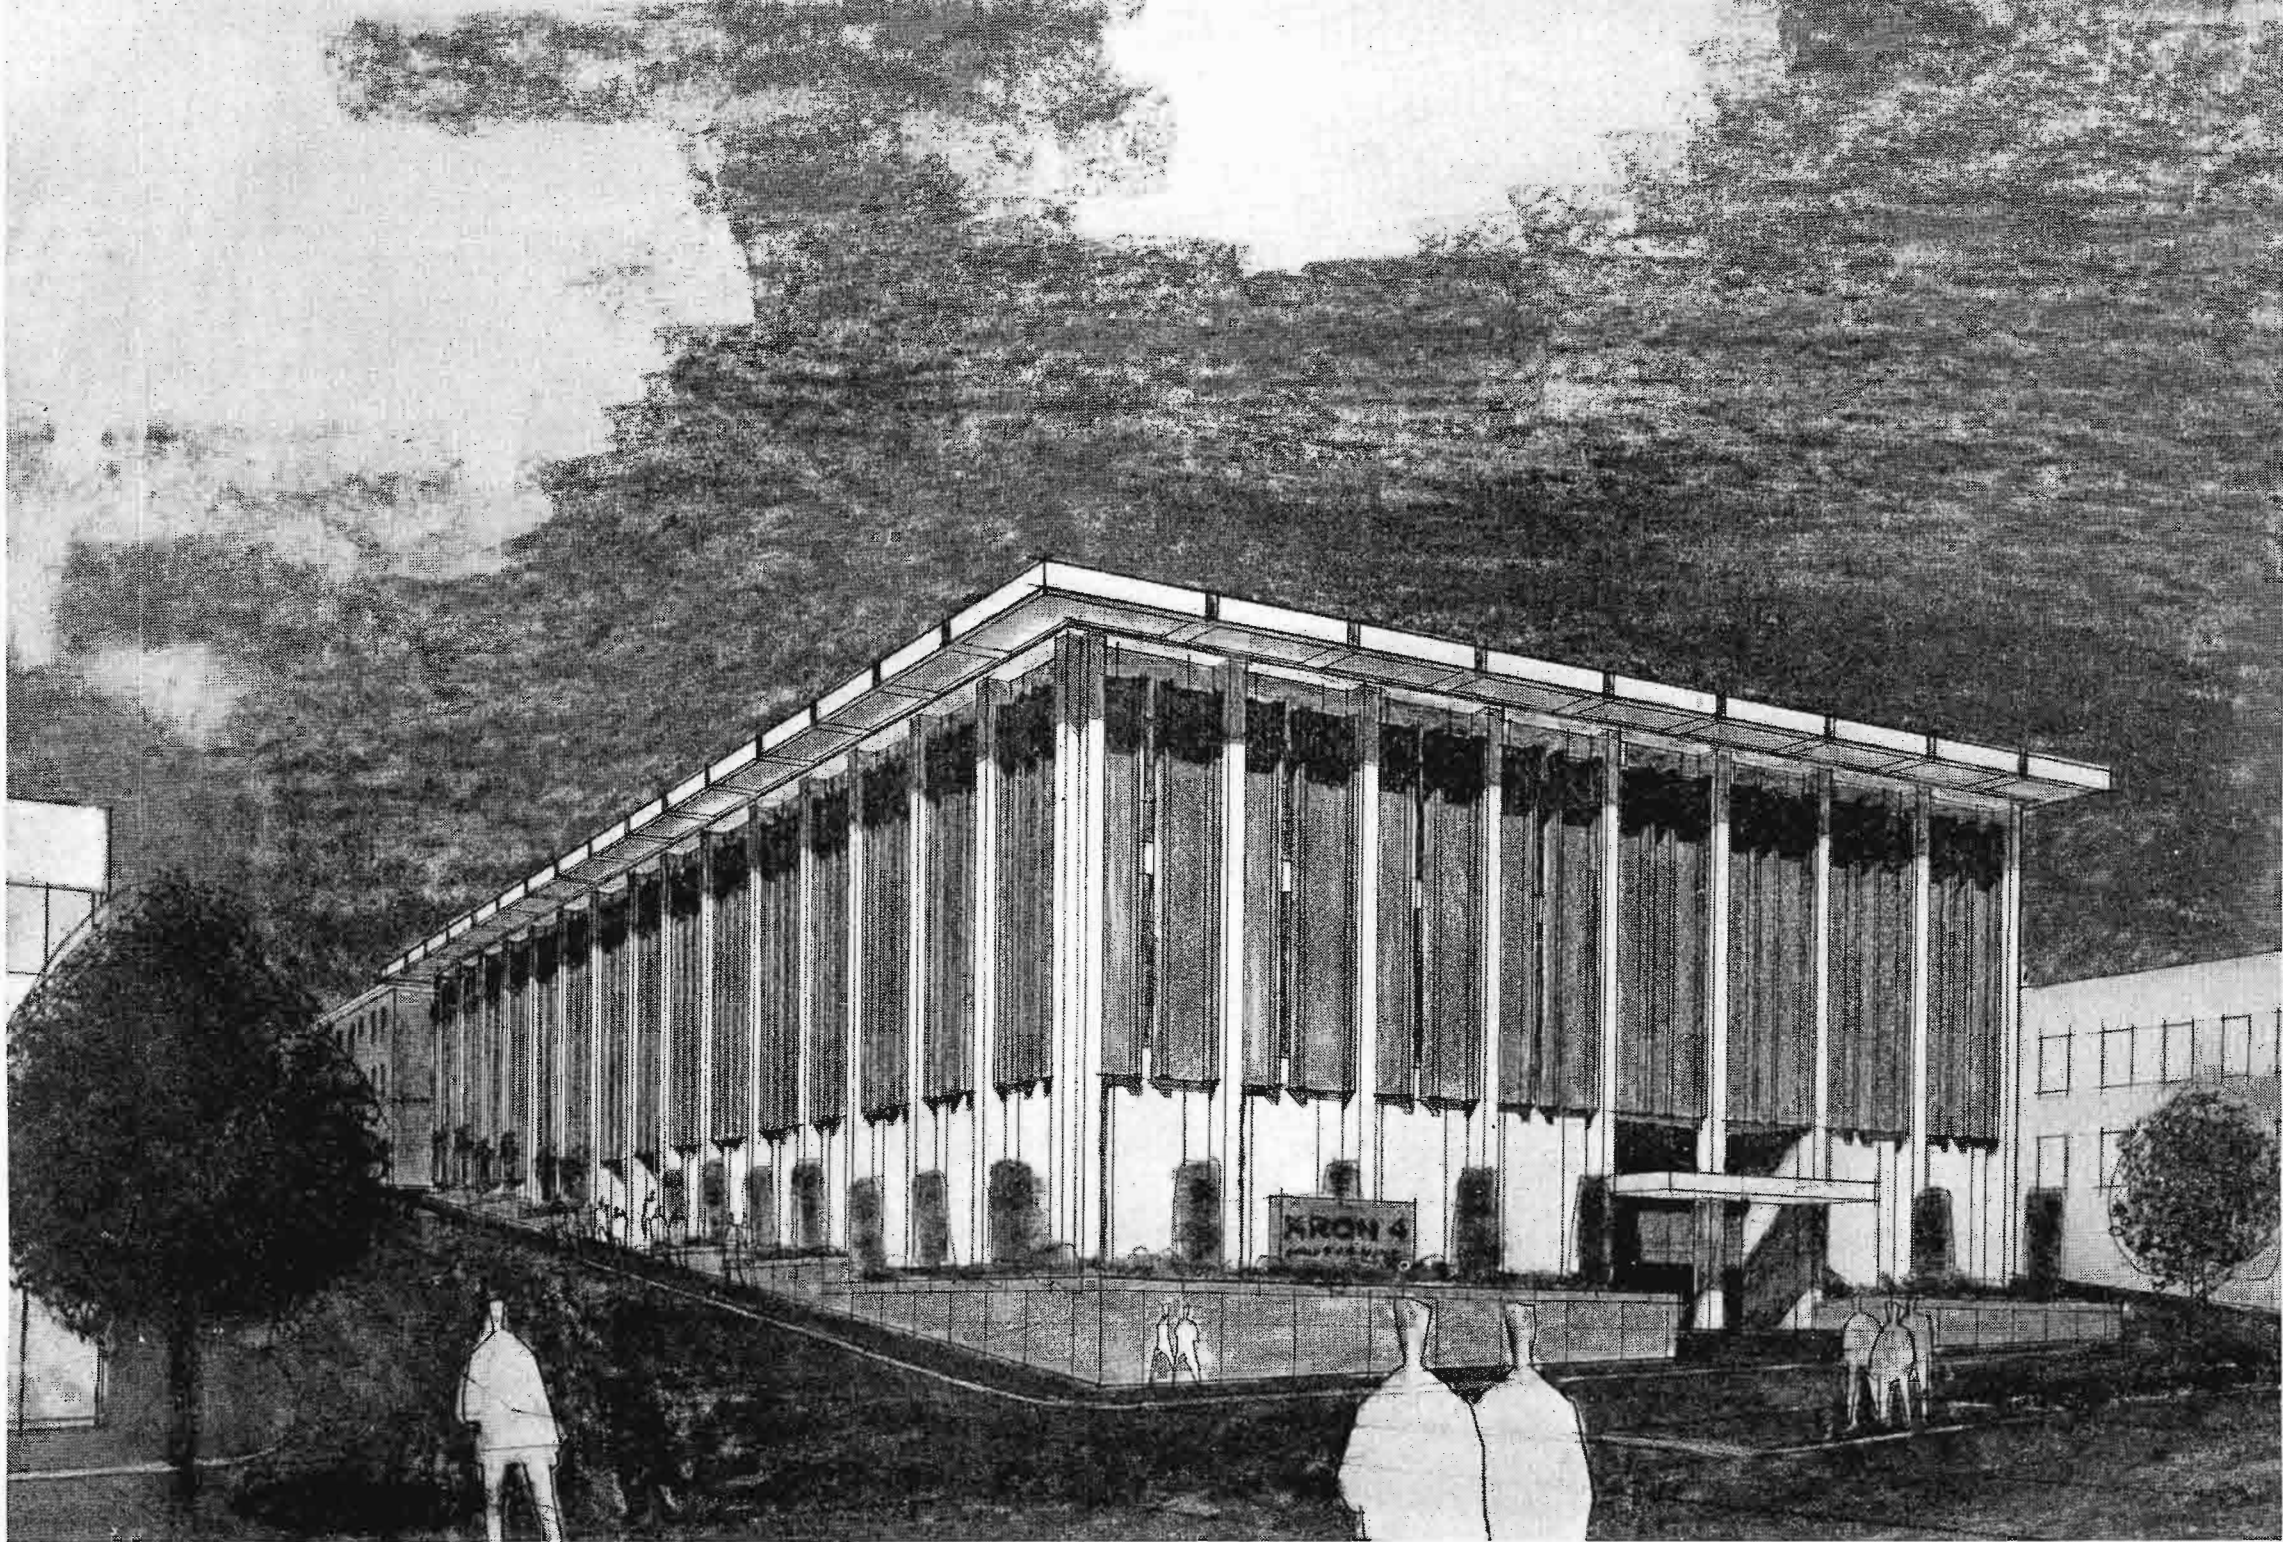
Architect's sketch of the new studio building that KRON-TV is erecting at Van Ness Street and O'Farrell Street, San Francisco. Poured-concrete, four-story building is 125 feet wide by 250 feet deep. Location on a steep hillside makes possible direct street-level access to each of the first three floors (from front, side and rear entrances, respectively). When completed (in early 1967), it will be the newest and finest station installation in the country.
